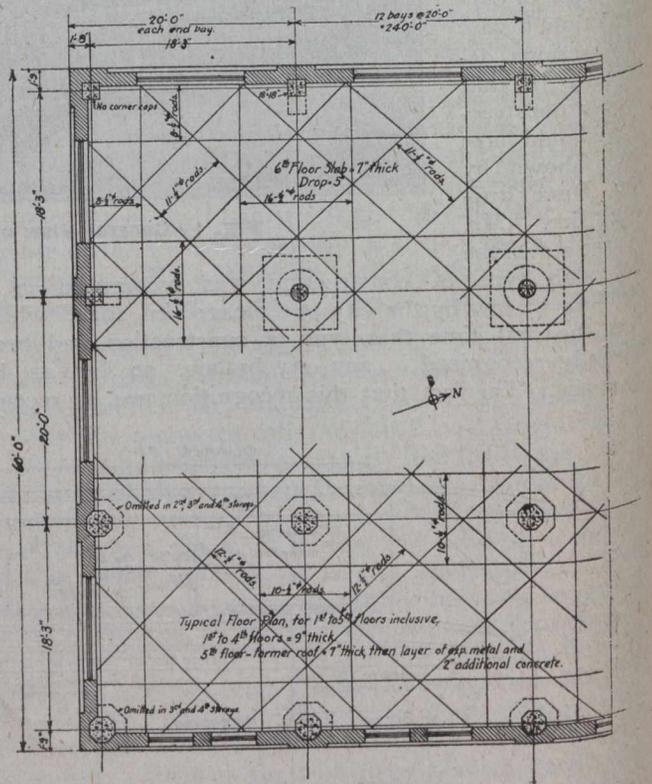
Horizontal Section Through Warehouse. (Section through A-A of Fig. 3)
